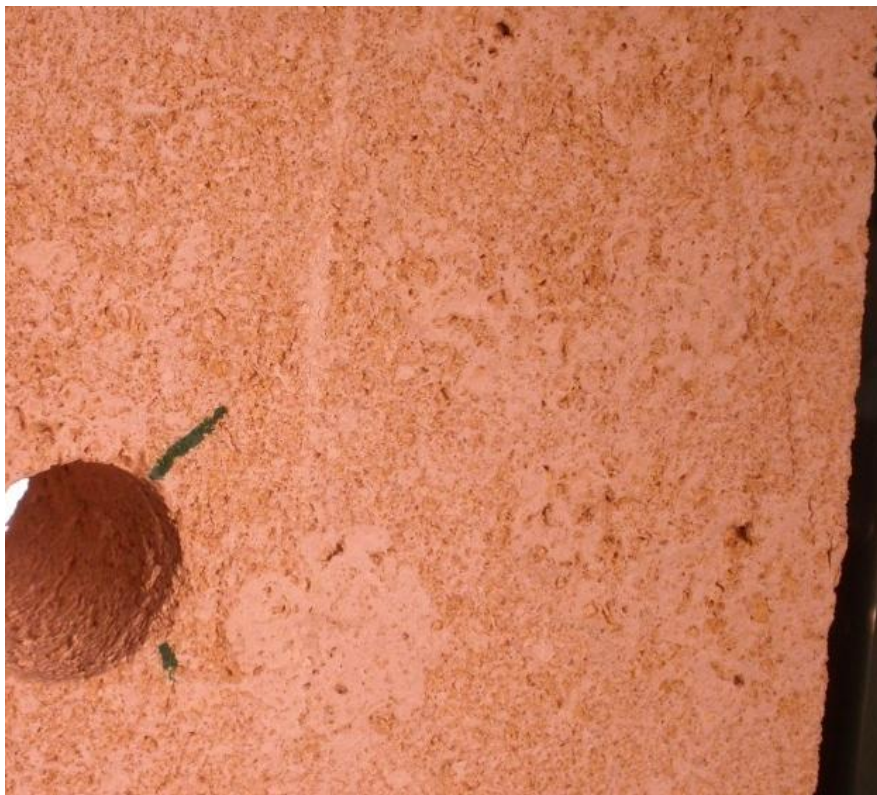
Cracks in specimen 12 for point 4 of the figure 5.11. Cracks on the side A of the specimen.
